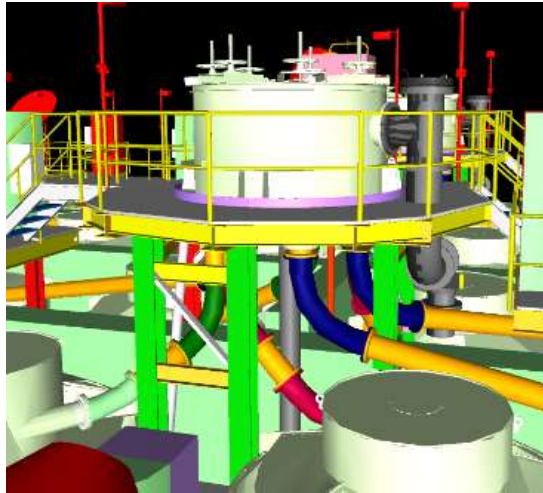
Install Overflow Wells & Feed assemblies; looking SE
